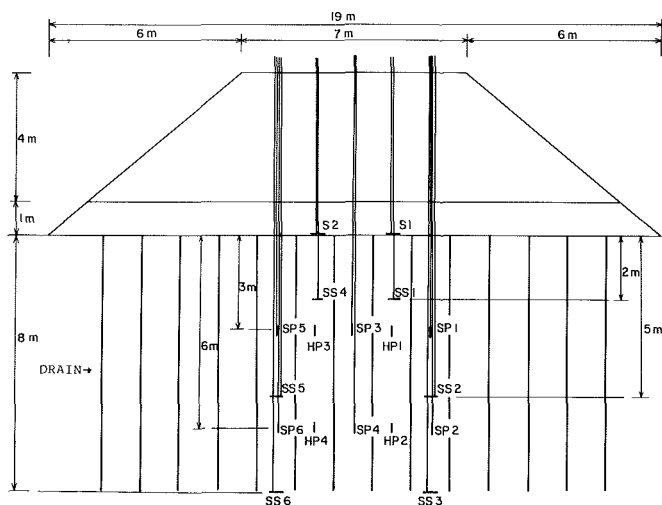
Longitudinal Section Showing Locations of Instrumentations
